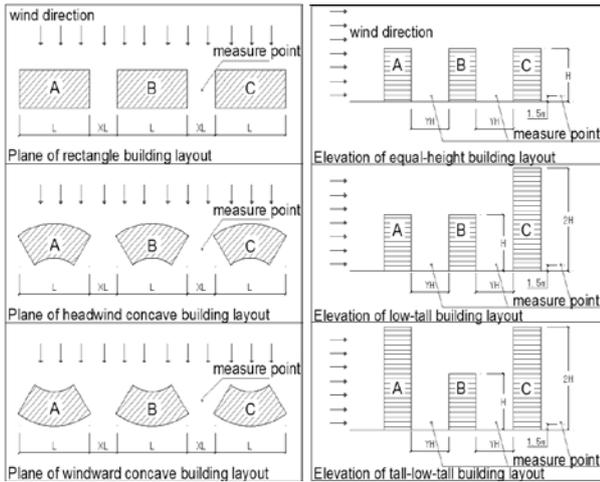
Gable spacing model: rectangle, headwind concave and windward concave building layout (left)
